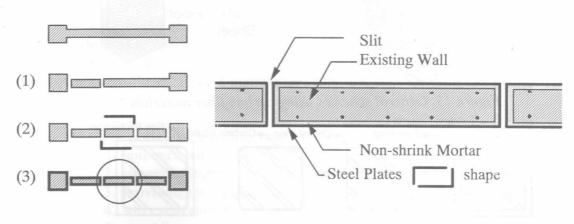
Construction procedures of steel jacketed slit wall <sup>4)</sup>
